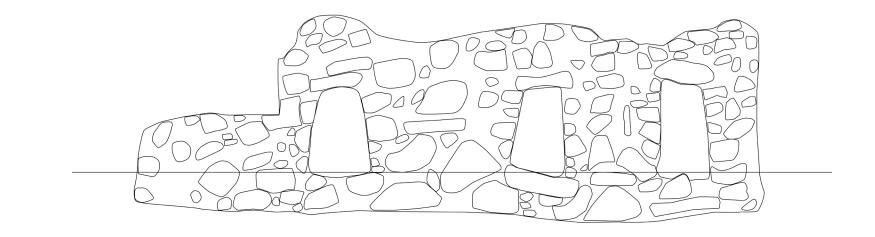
Inside elevation of the South wall of Building NS6, Kañaraqay
